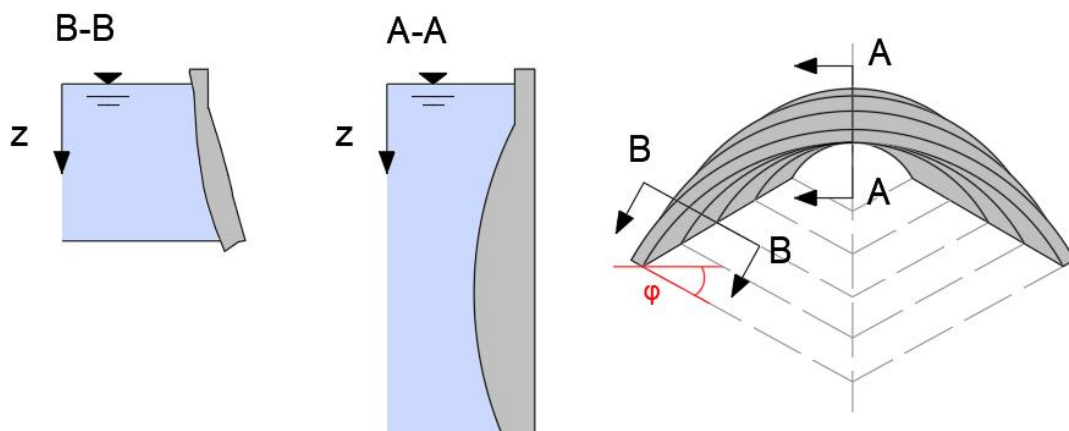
Constant-angle arch dam - layout and cross section, cf. [3]
